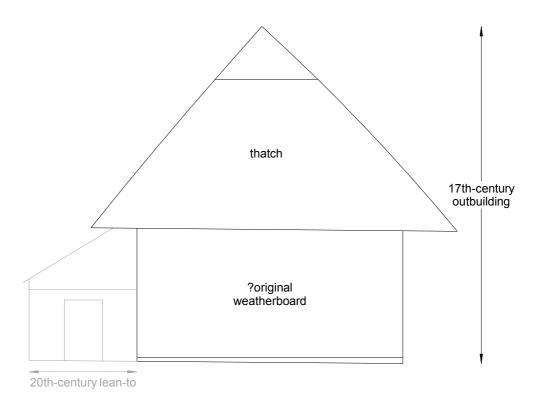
East elevation of structure 5 (17th-century outbuilding), with alterations shown grey.
